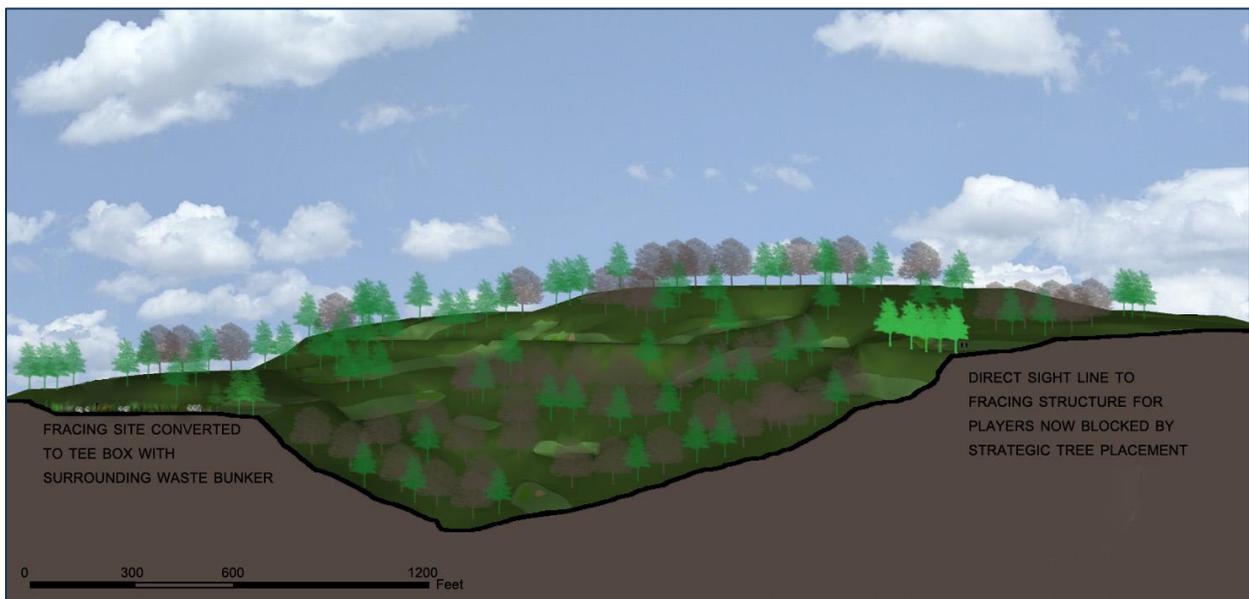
Fracing Visual Impact - Section-Elevation (After)
